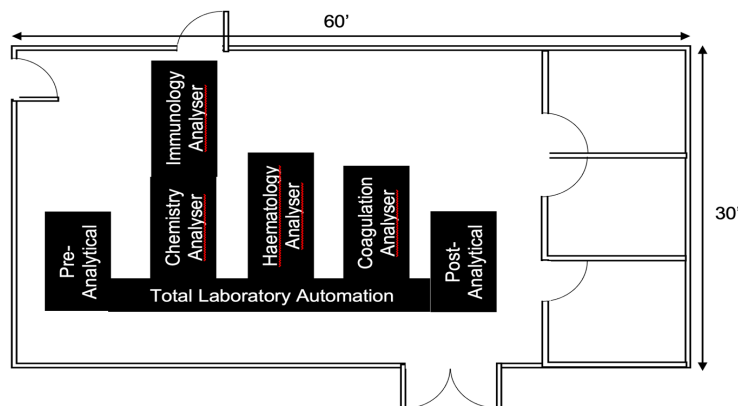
HUSM's CDL proposed floor plan and equipment placement layout
